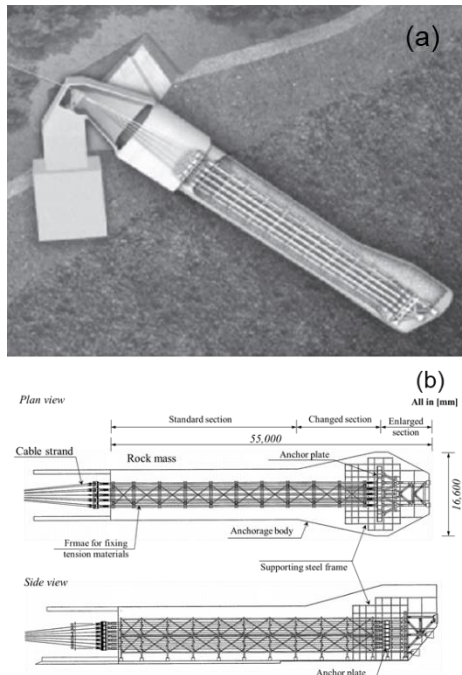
Typical shape of tunnel-type anchorage: (a) schematic diagram and (b) plan view and side view (Yooshin Co., Ltd. 2009)
